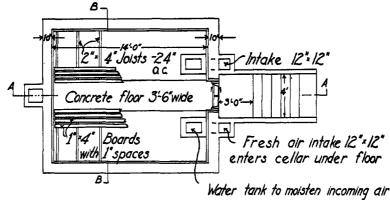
Plan for a section of a basement arranged for vegetable storage.
